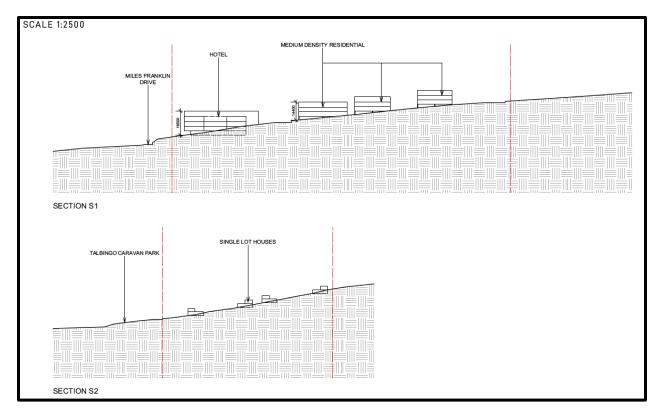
Site Sections (Source: Robert Harwood Architects)
